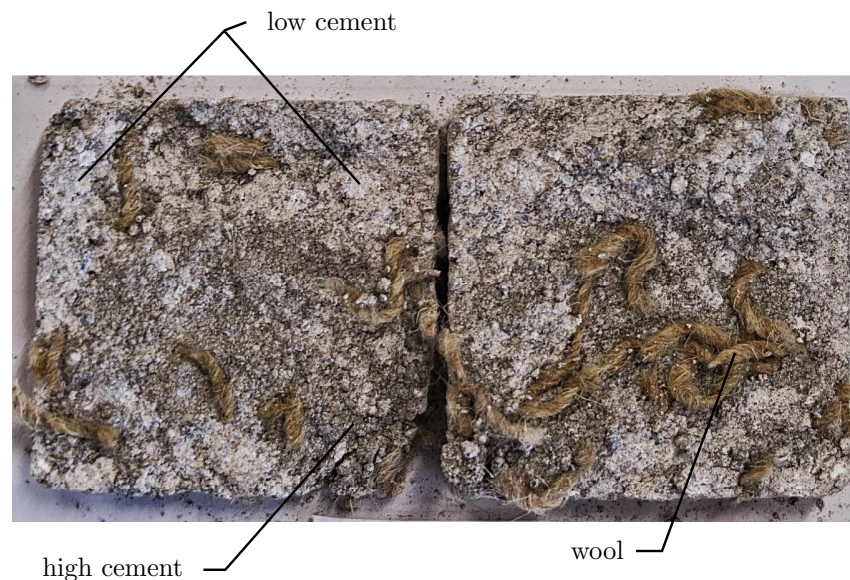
Photograph showing the top (L) and bottom (R) halves of the fracture plane of sample D-W1C4-1.
